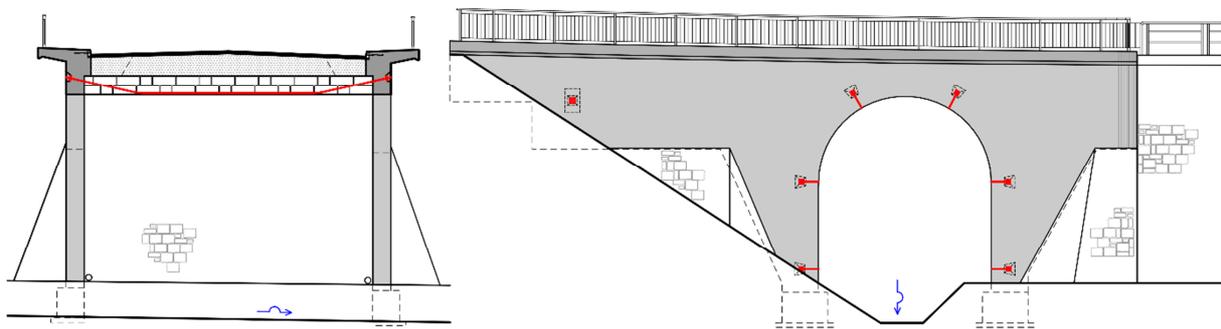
Example of design reconstruction of a road bridge using transversal post-tensioning with RC face walls.
